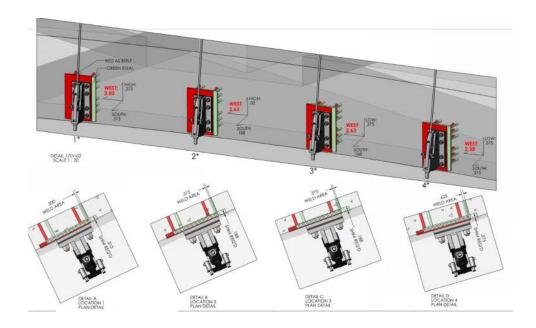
These are the cable base anchorages on the same conoid wall. This illustration depicts the location of the embed plates w/r/t their ideal locations. All of the embeds long this face were well out of spec. In these locations the cable brackets could be used as designed since the wall design team assumed that the embeds would be substantially further out of place than the agreed 25mm.
